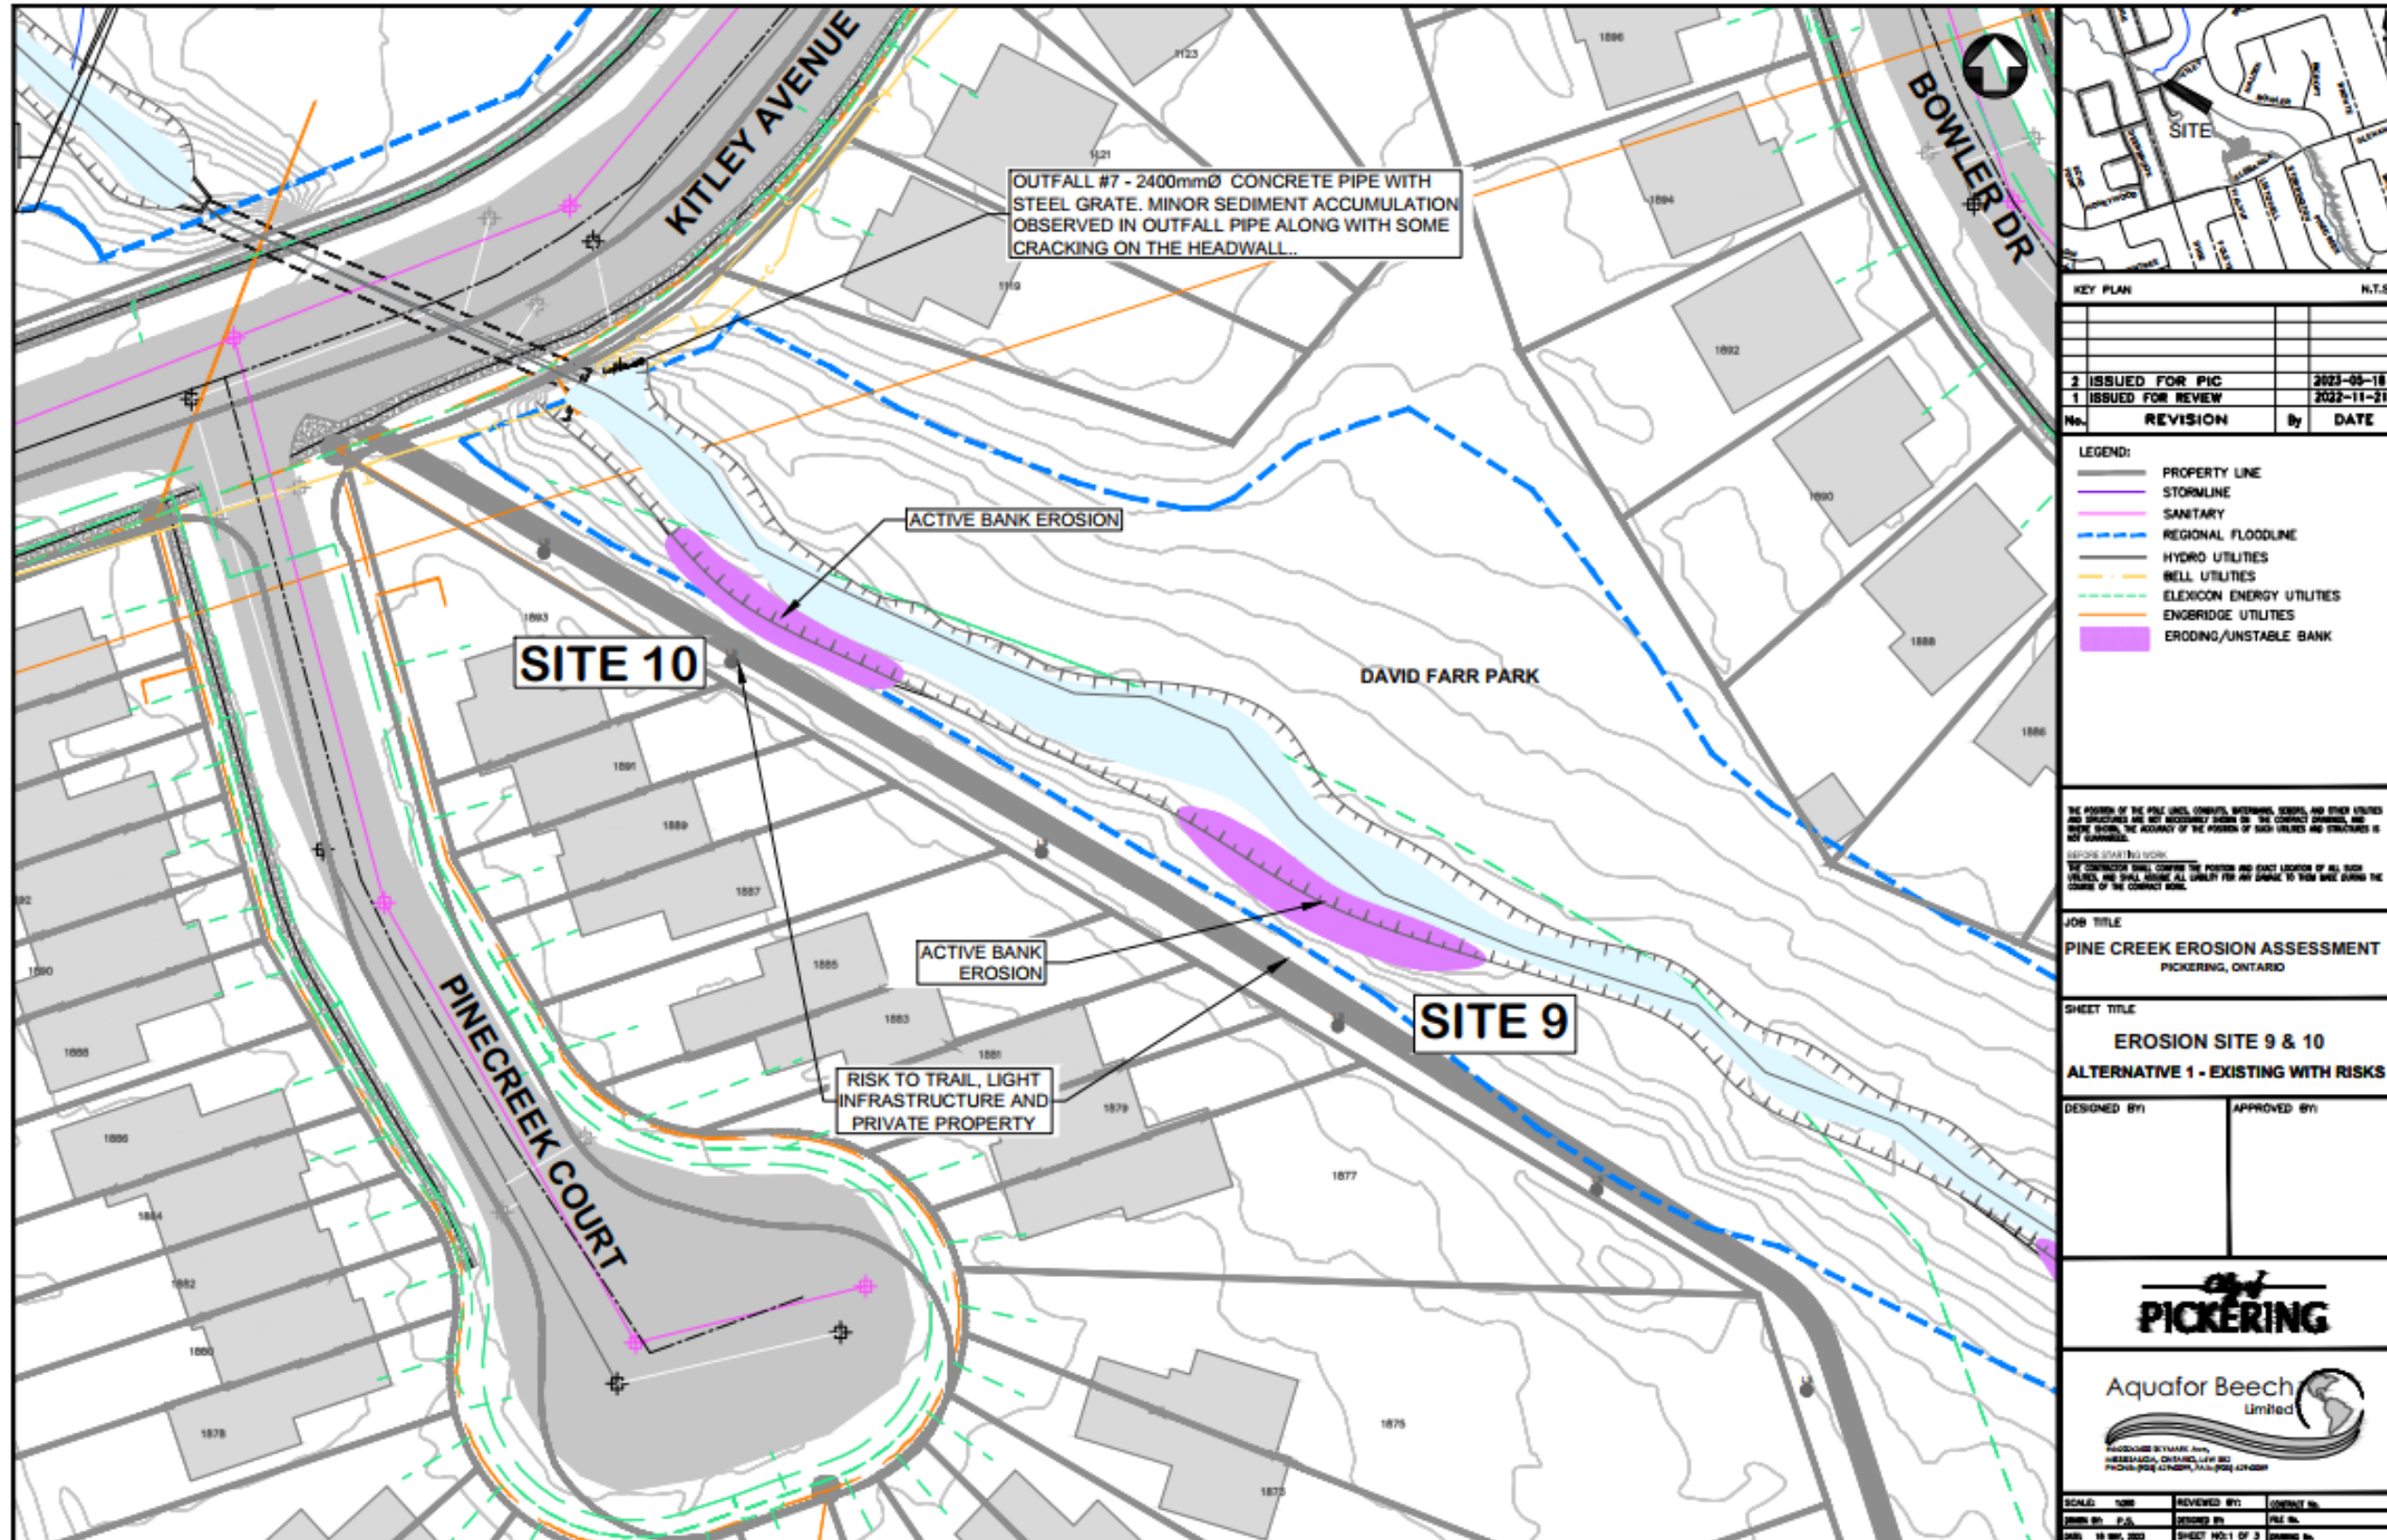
Erosion Site #9-10: Existing Site Conditions
